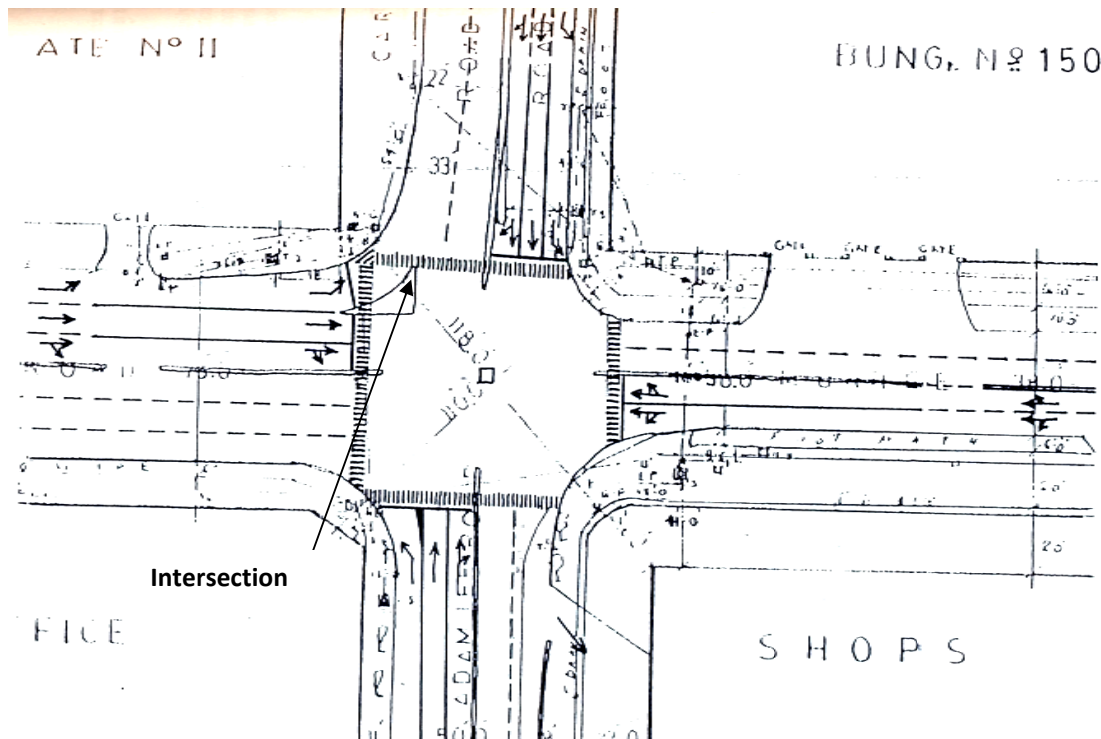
11 Intersection Murree Road/Adamjee Recommended Redesign
